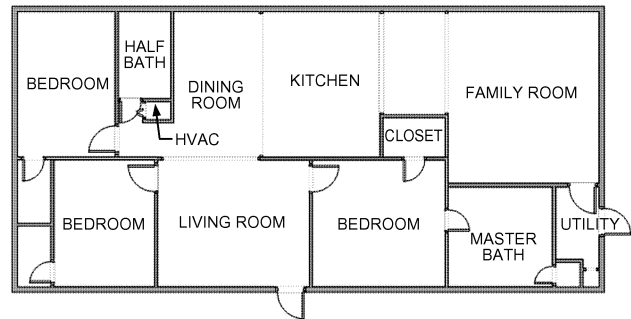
Floor Plan of Living Area Level of Manufactured House
